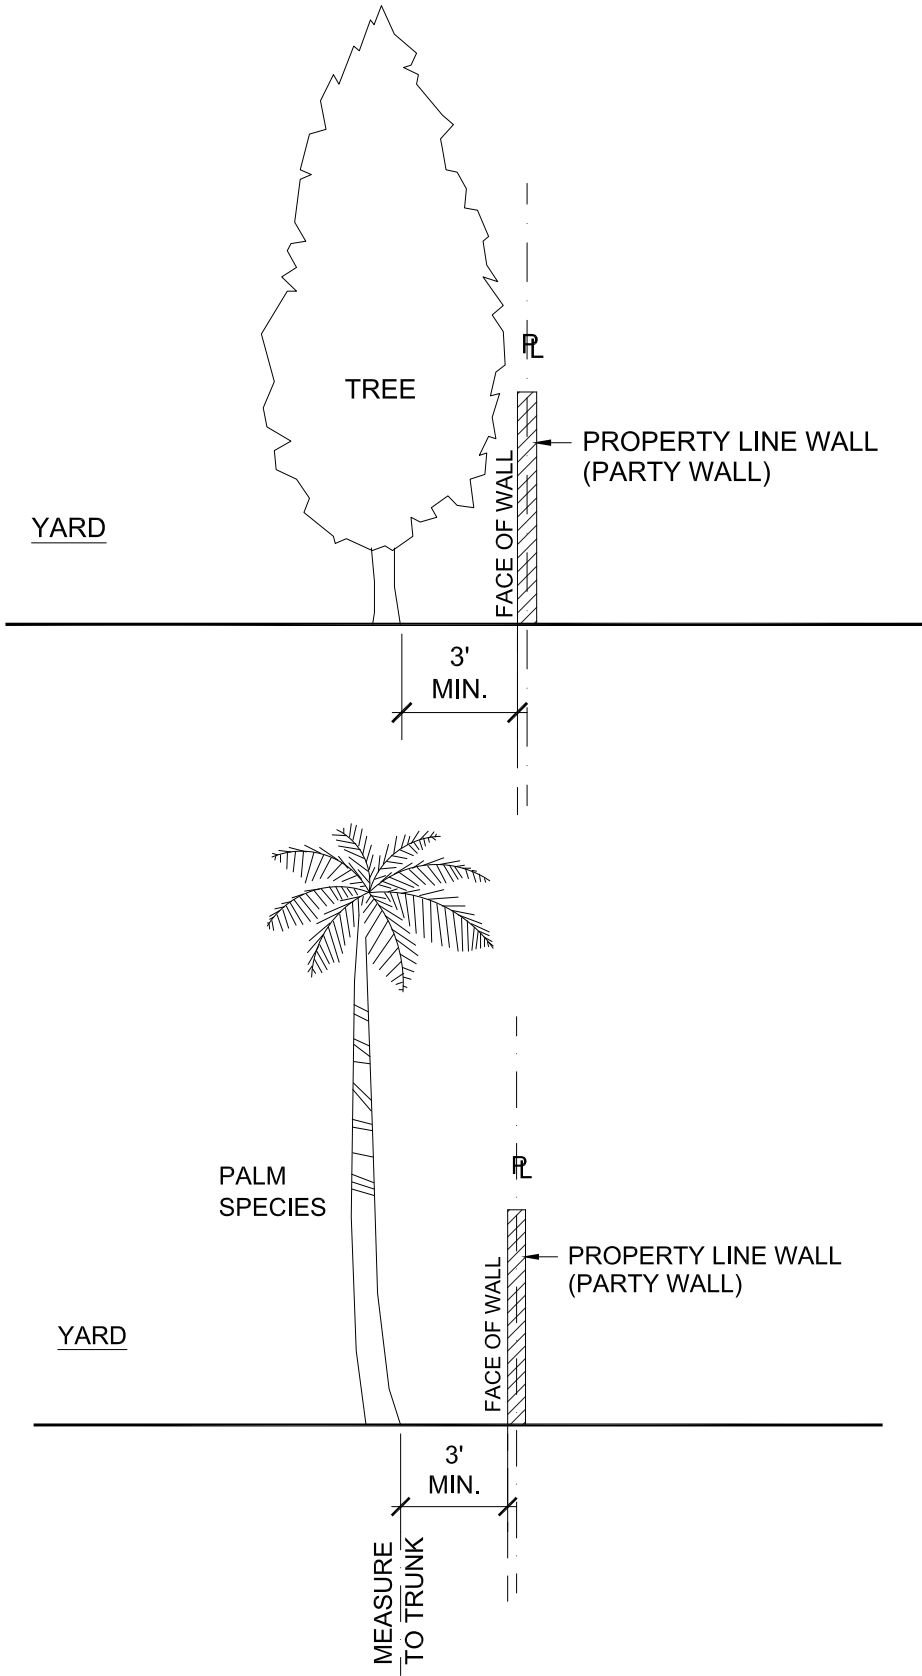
G: MINIMUM PLANTING DISTANCES
